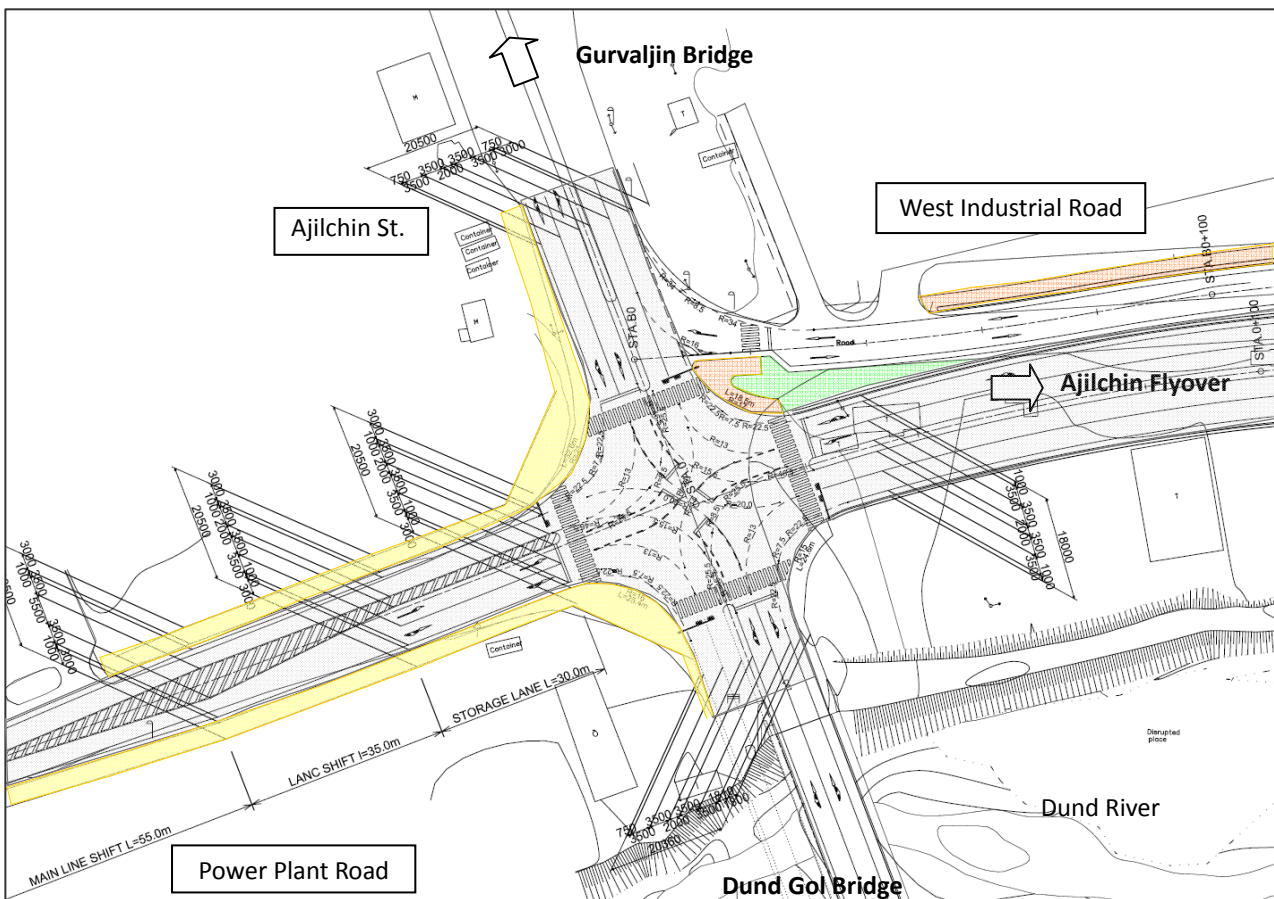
Plan of Intersection with Ajilchin Road
